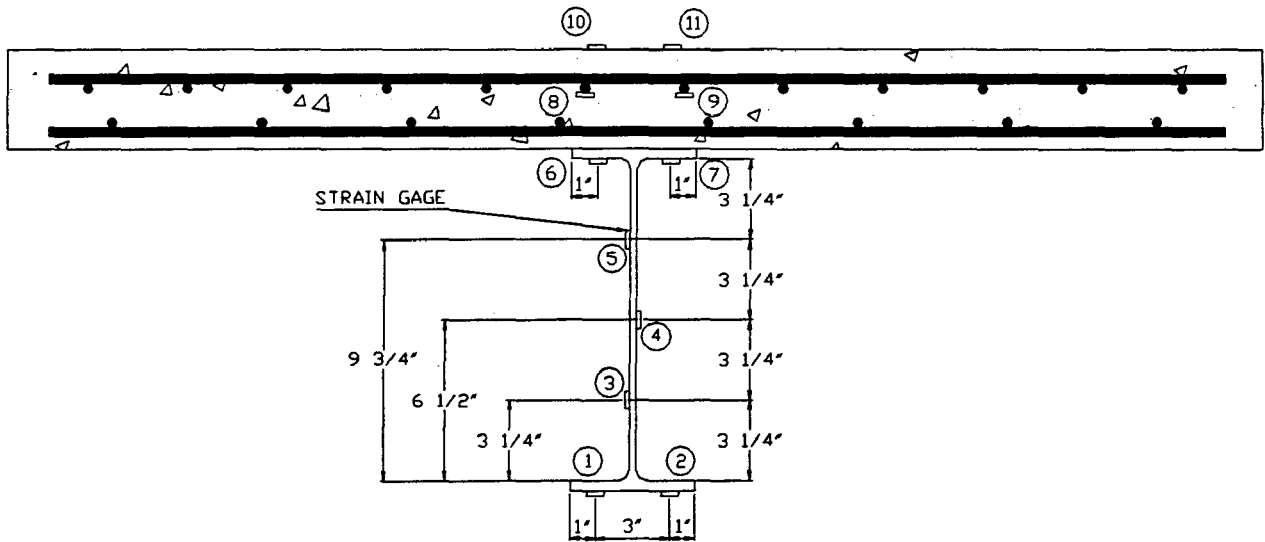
Test Girder Cross Section and Strain Gage Layout
